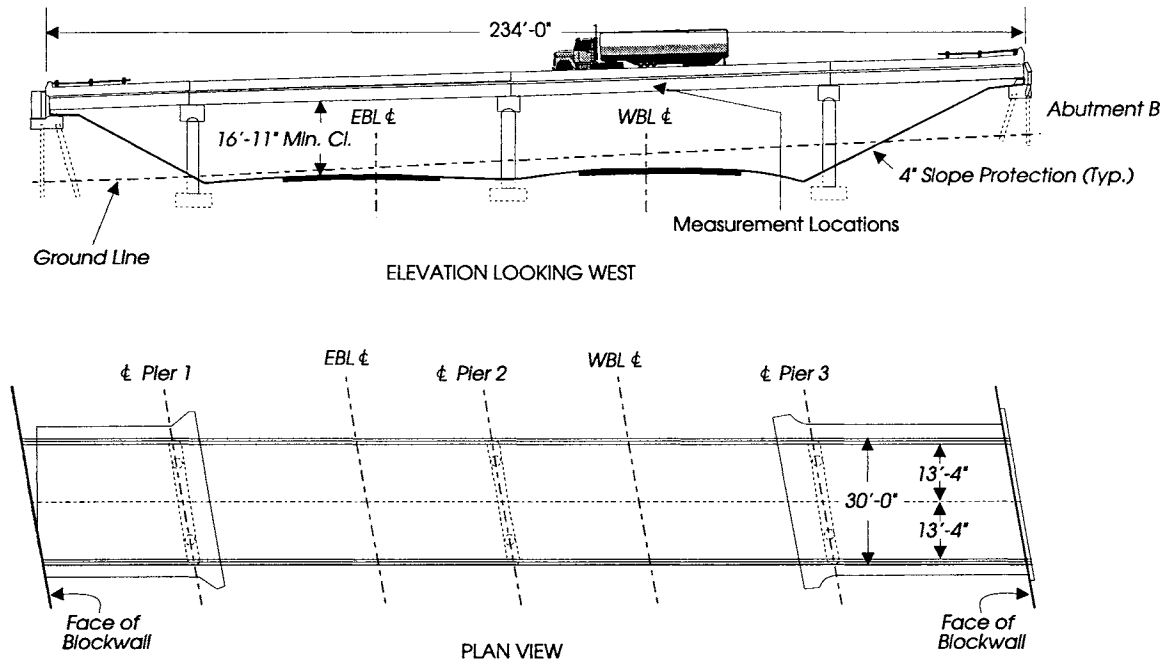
Elevation and plan for the Rte. 691 bridge over I-64.
